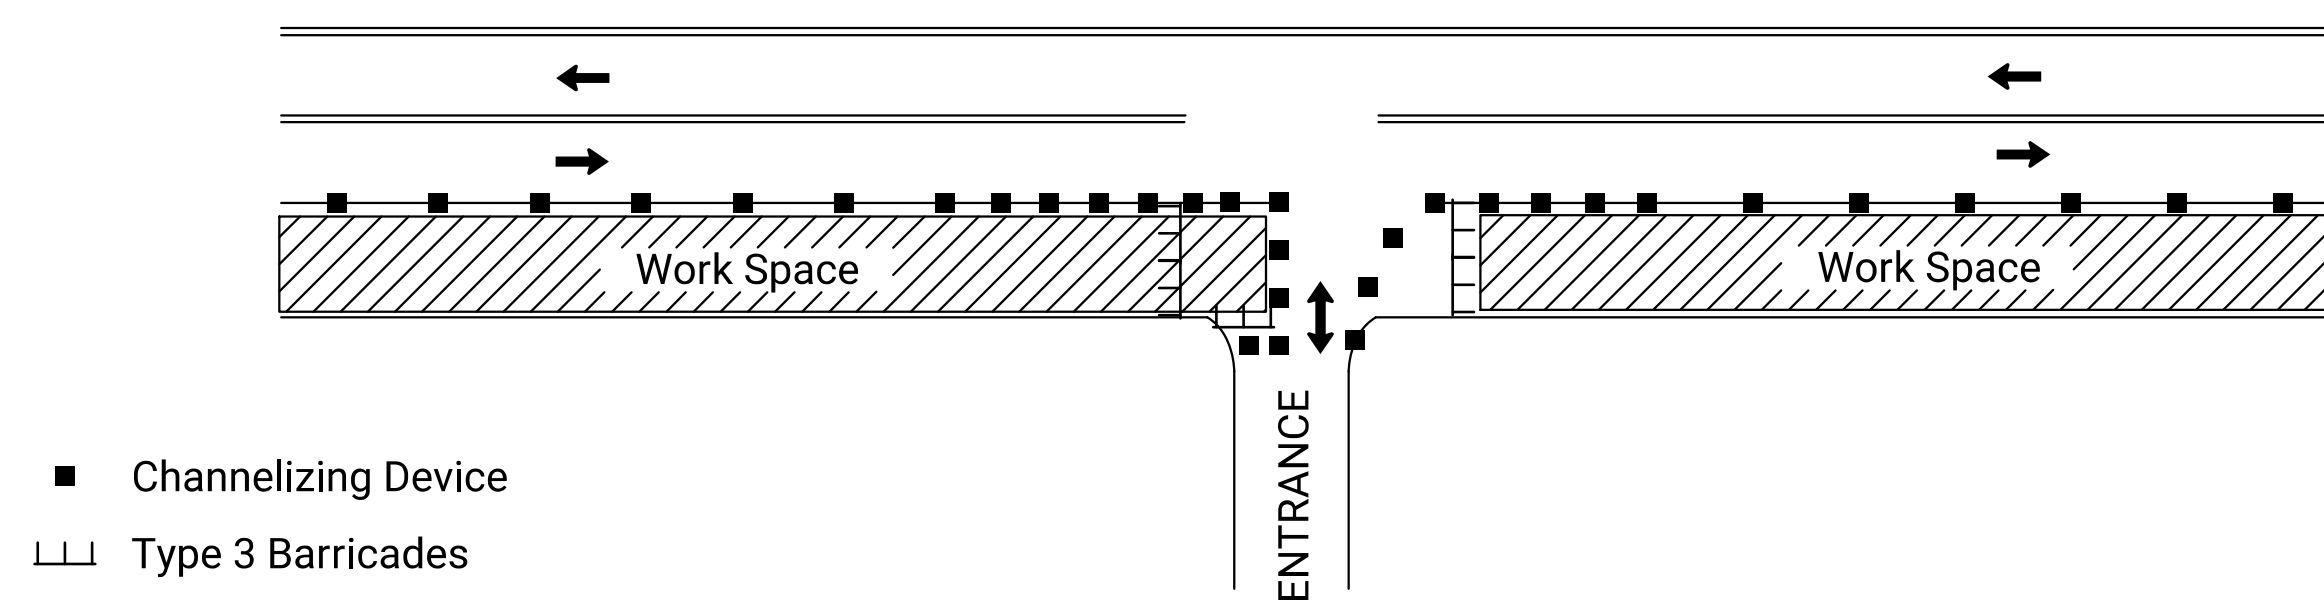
SIDE ROAD OR ENTRANCE CONSTRUCTED HALF AT A TIME: TWO WAY TRAFFIC REQUIRED
